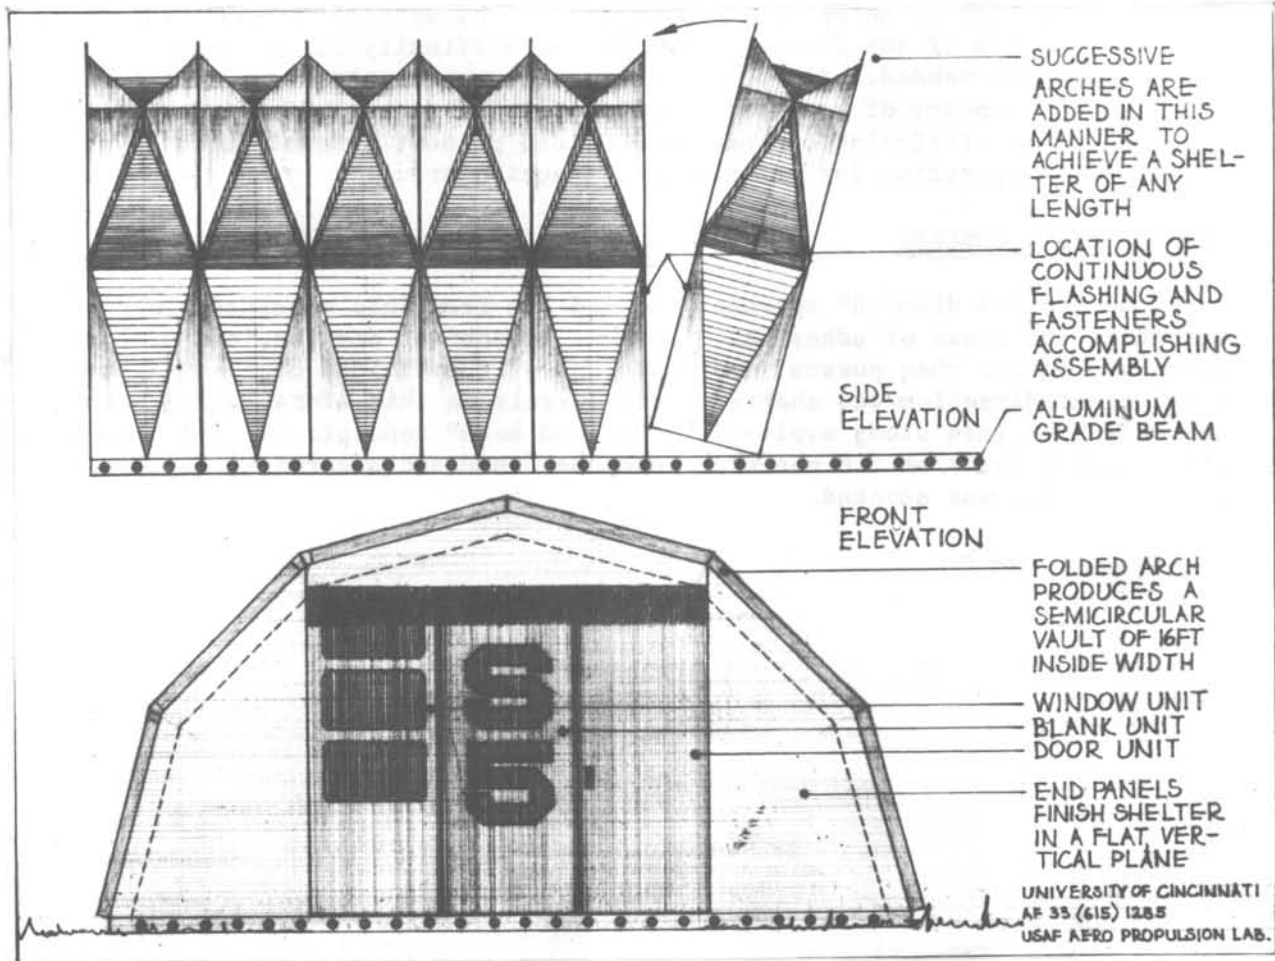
Drawing - Elevations of "folded diamond" concept shelter
